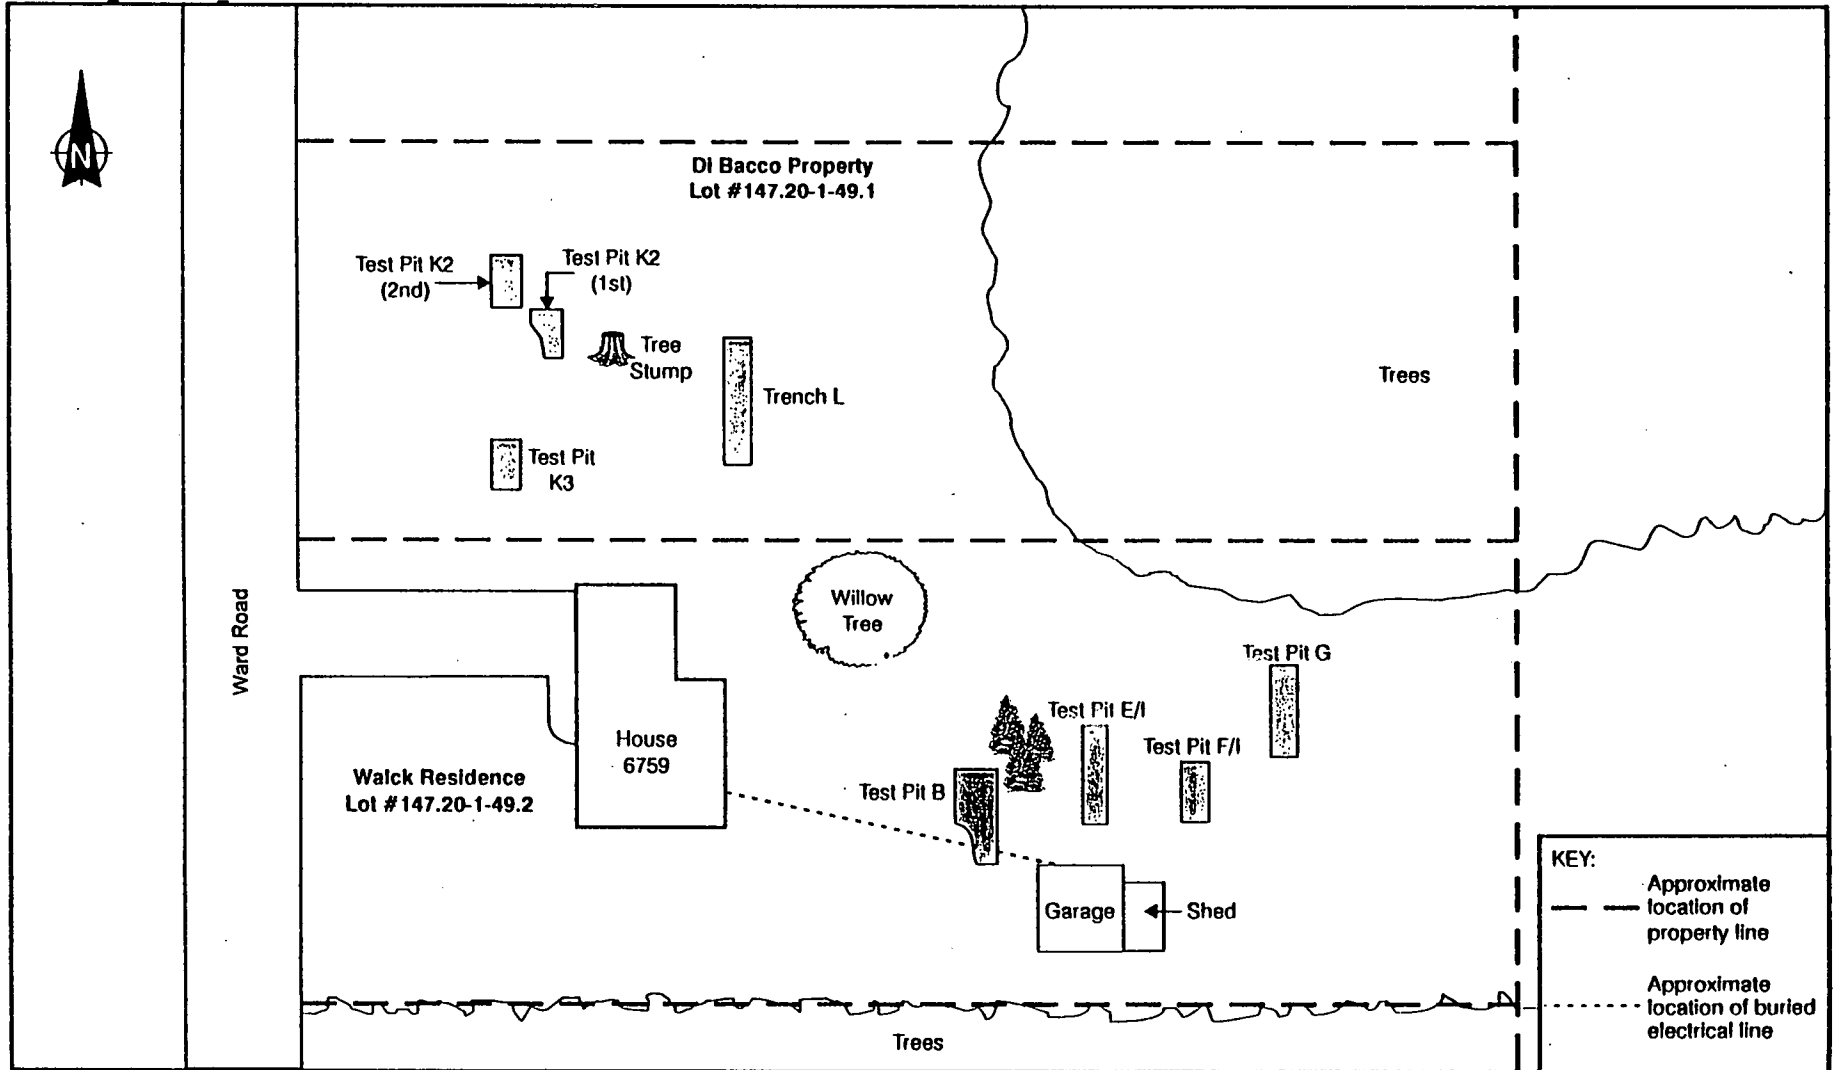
PLANNED SUBSURFACE EXCAVATIONS
